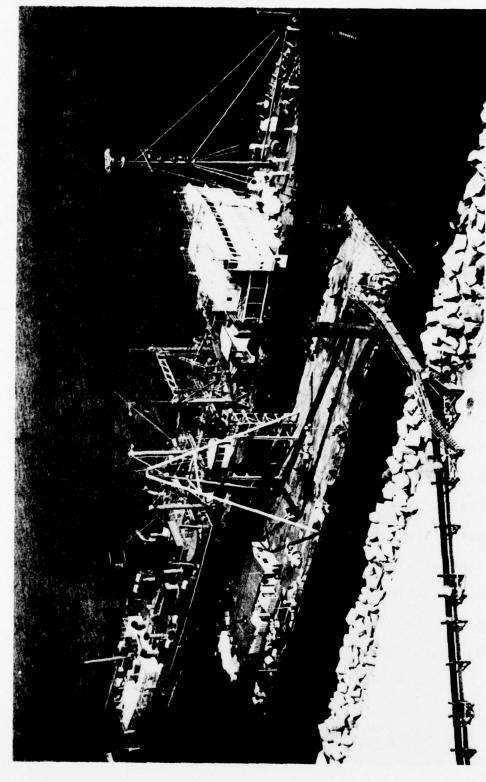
Hopper Dredge Goethals and MB-1 Berthing Arrangement -- Jacksonville, Florida Test Site.
